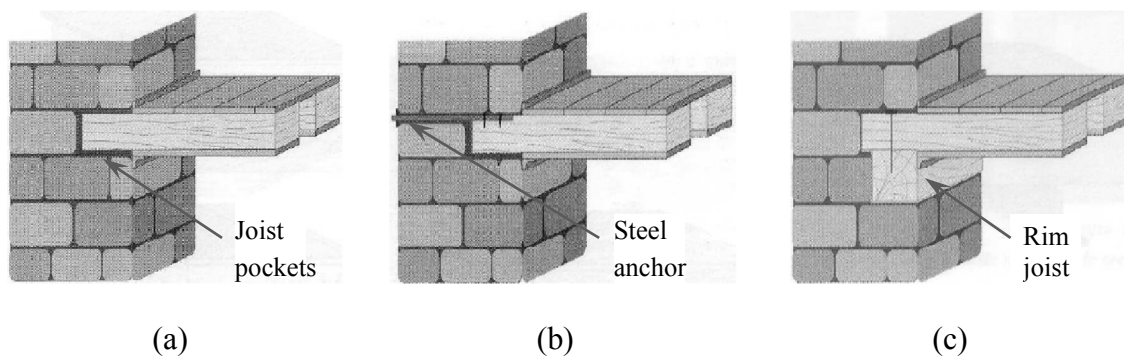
Connection of floors to masonry load-bearing walls: (a) insertion of timber joist at the pocket of the wall; (b) improving of the connection through steel anchors; (c) connection with rim joist (adapted from Appleton 2003).
